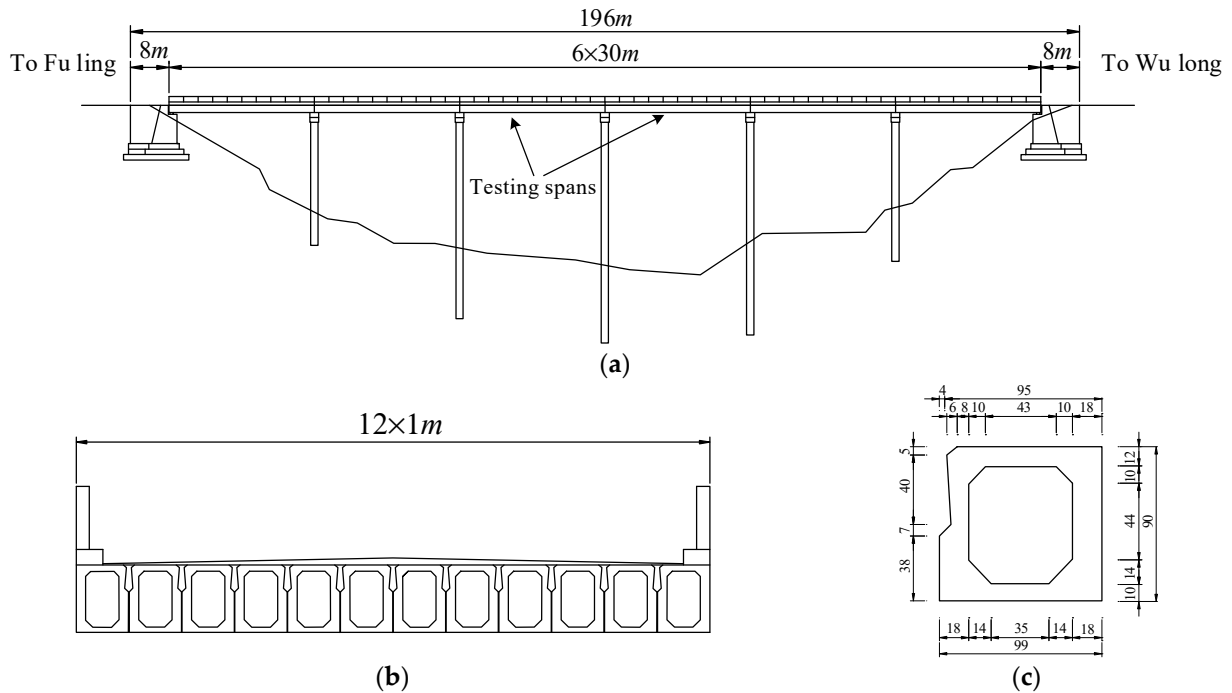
Testing bridge: (a) Bridge elevation; (b) Bridge cross-section; (c) Girder cross-section.
